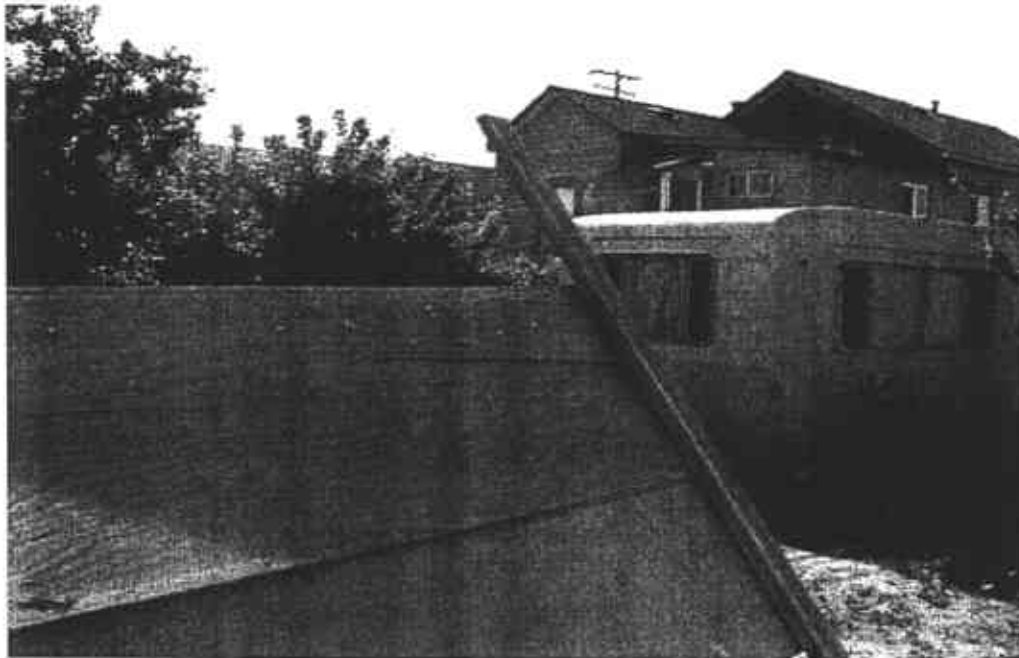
View looking at the adjacent residential property to the southwest of the subject property.
